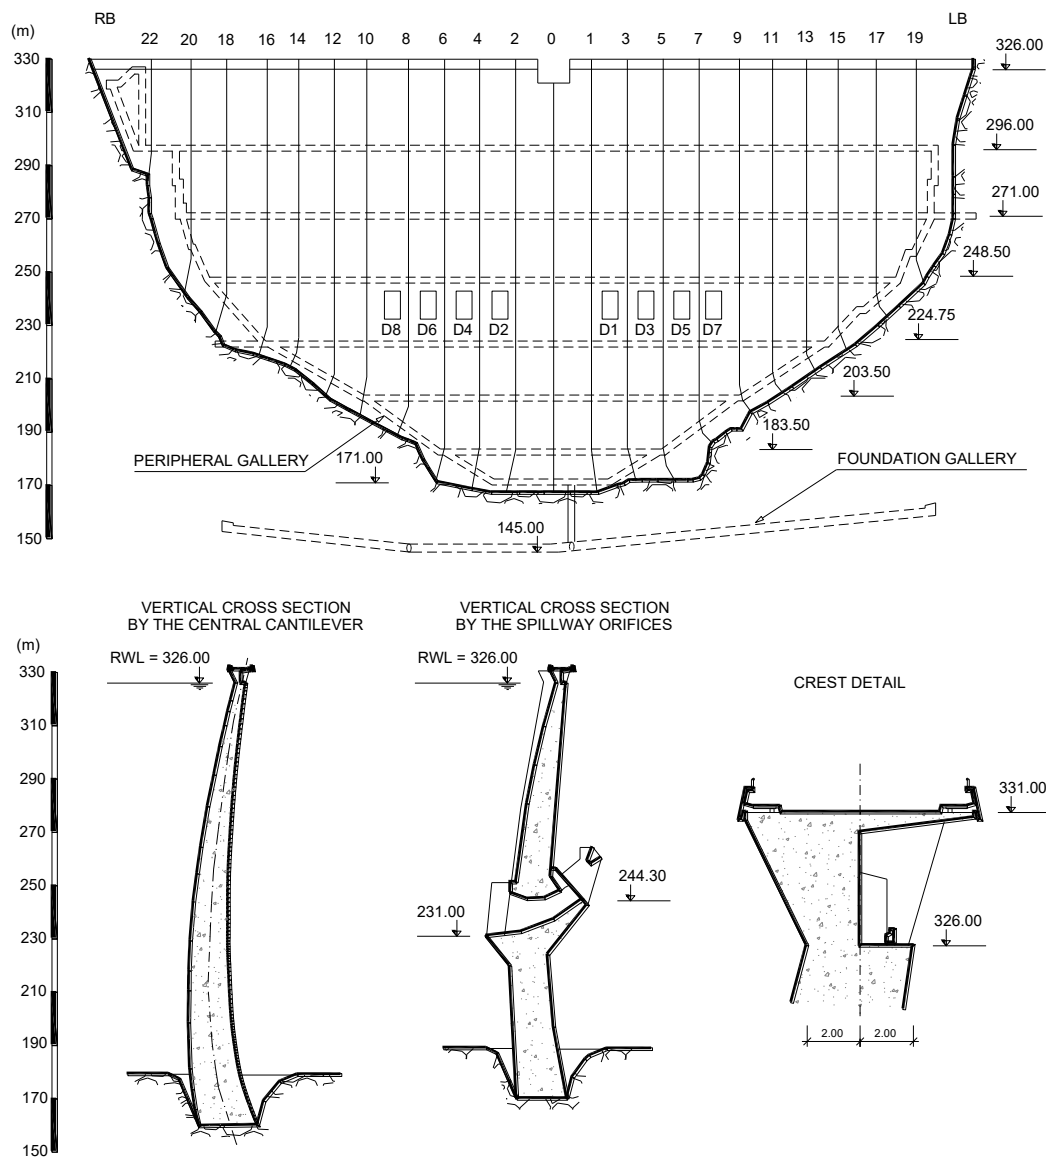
Cahora Bassa dam. Downstream elevation, vertical cross-sections and crest detail
